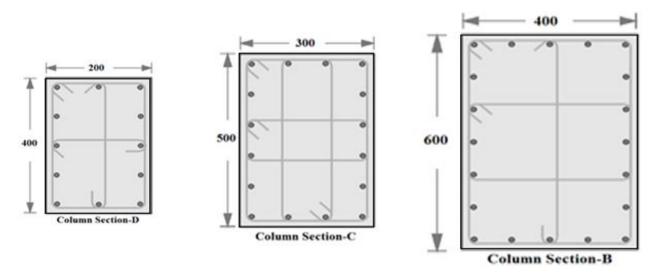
32: Final Column Design Sections (ETABS 2016)
